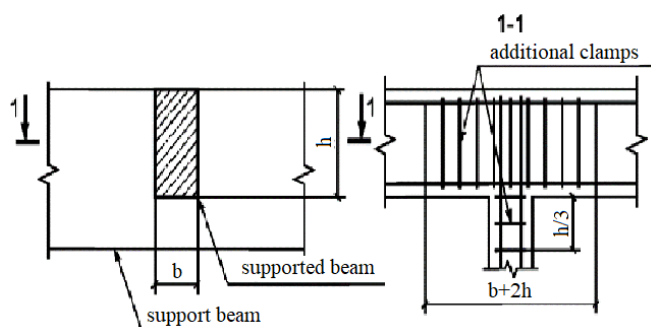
Placement of support reinforcement in the area of the two beam intersection [4]
